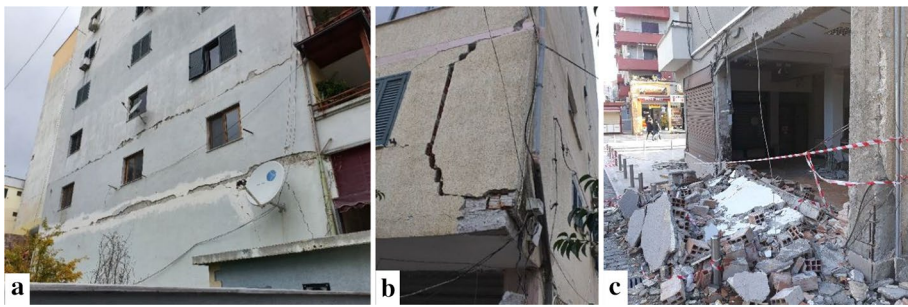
Residential RC building with non-structural damage to the external facade (Grade 3). a horizontal cracks in facade; b cracks in cantilever part; c facade failure
